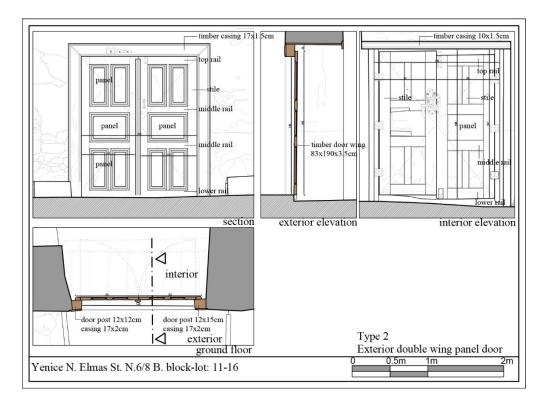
Drawing of exterior double wing panel door located on stone masonry wall; Type 2 (Yenice N. b. block-lot: 11-16)
